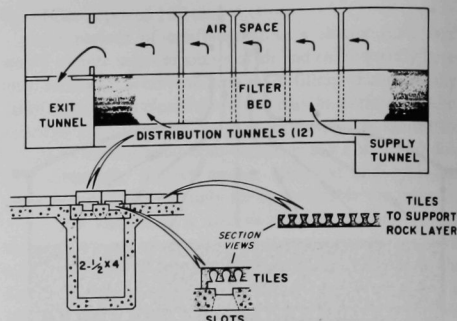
Sectional View of Sand Filter (Sykes and Harper, 1968b, p. 4).
